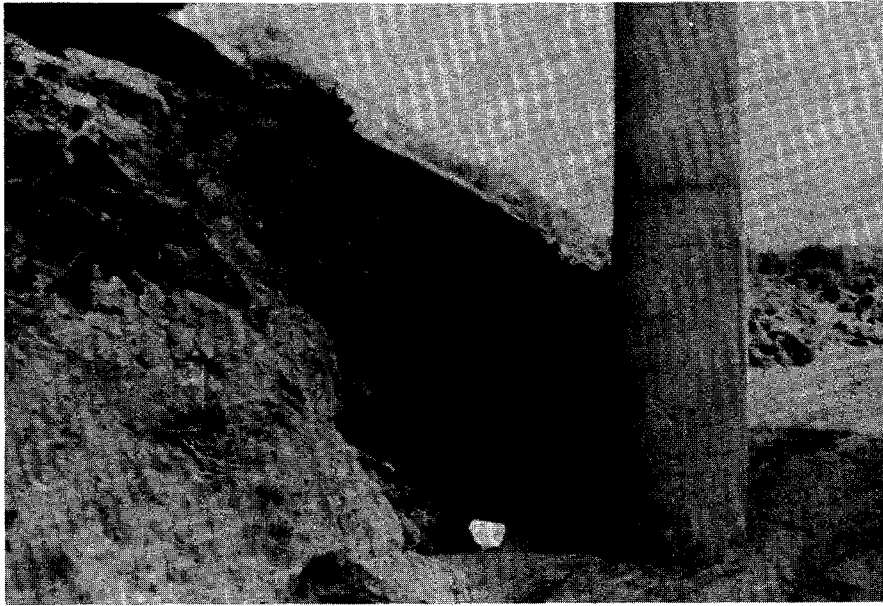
Local scour at upstream side of left bank pier, as observed in 1976.
